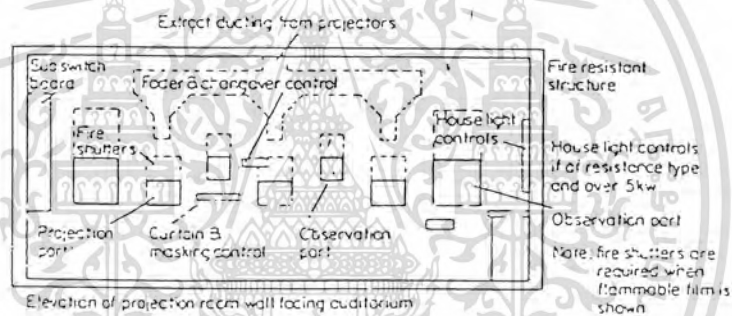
Typical arrangement of control rooms and lighting galleries
